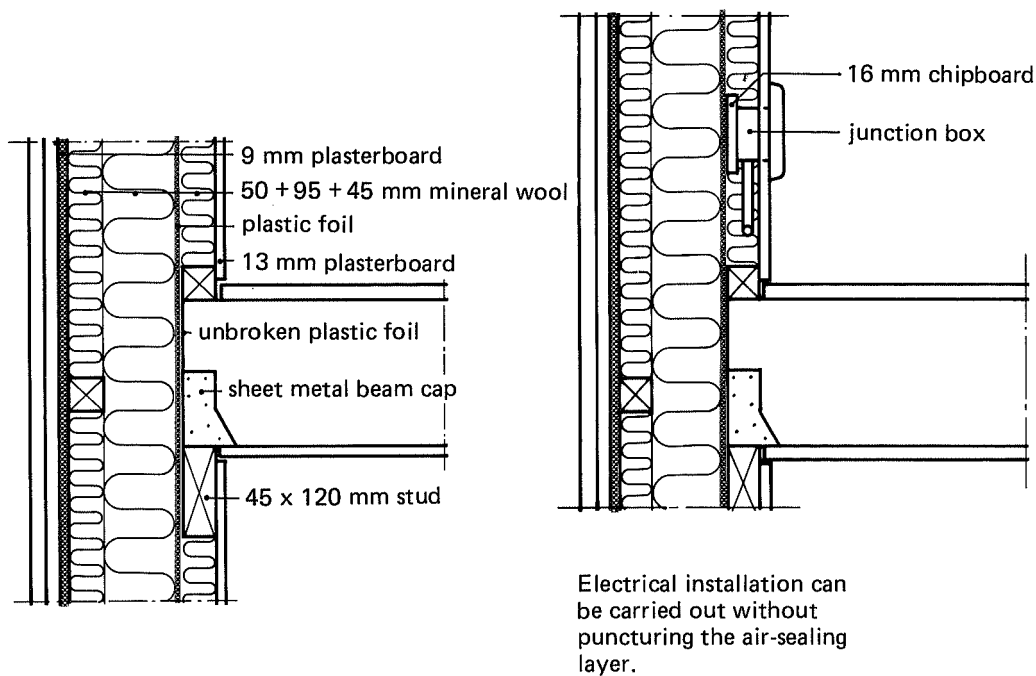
A joint between external wall and intermediate joist structure in the «balloon house». The intermediate joist is supported both on the inner horizontal studs and the sheet metal beam caps of the vertical framework. The design also means that both the insulation and the air sealing layer can be extended past the joist structure joint without complicated overlaps. The most important aspect of this is the reduction of air leakage risks.
